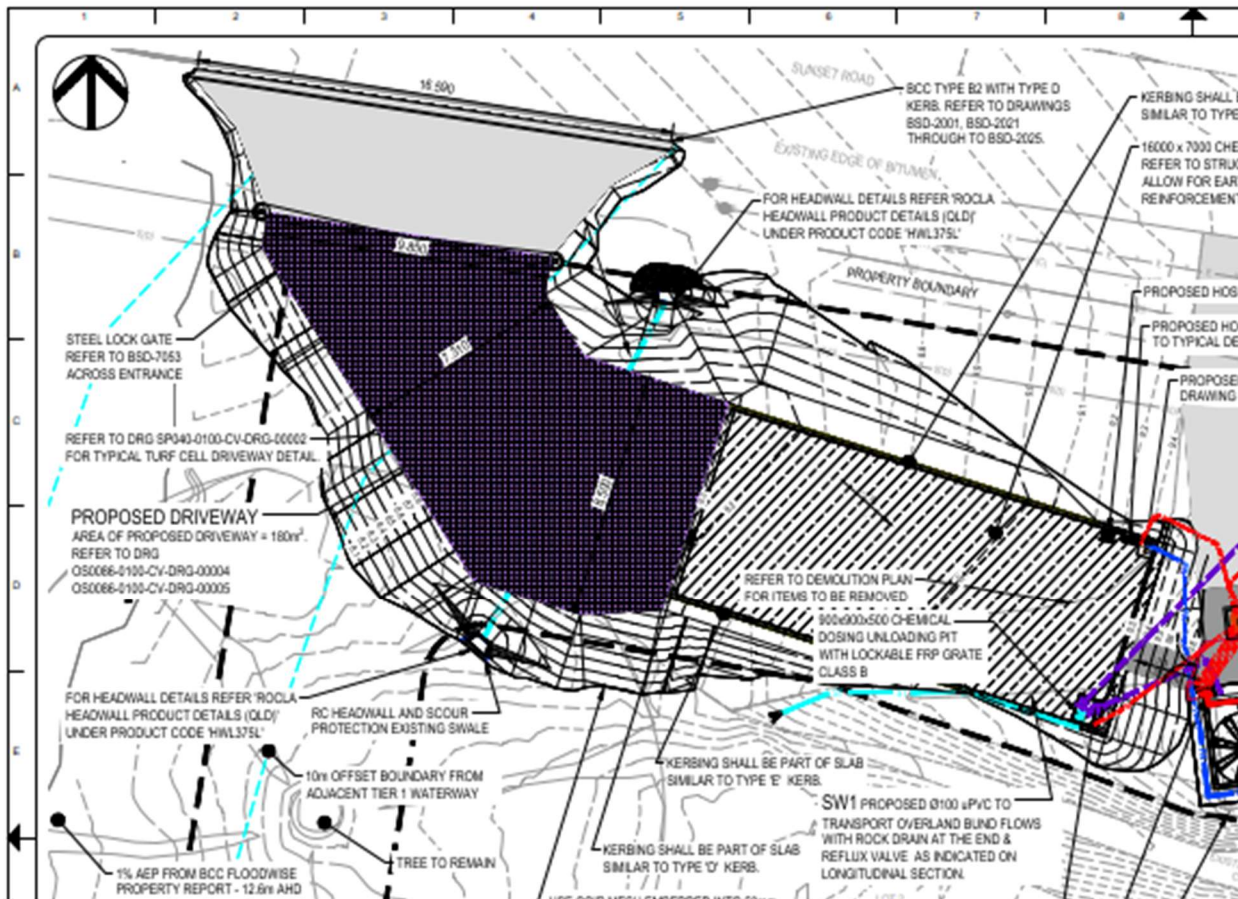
Amended Civil General Arrangement design for stormwater drainage.
